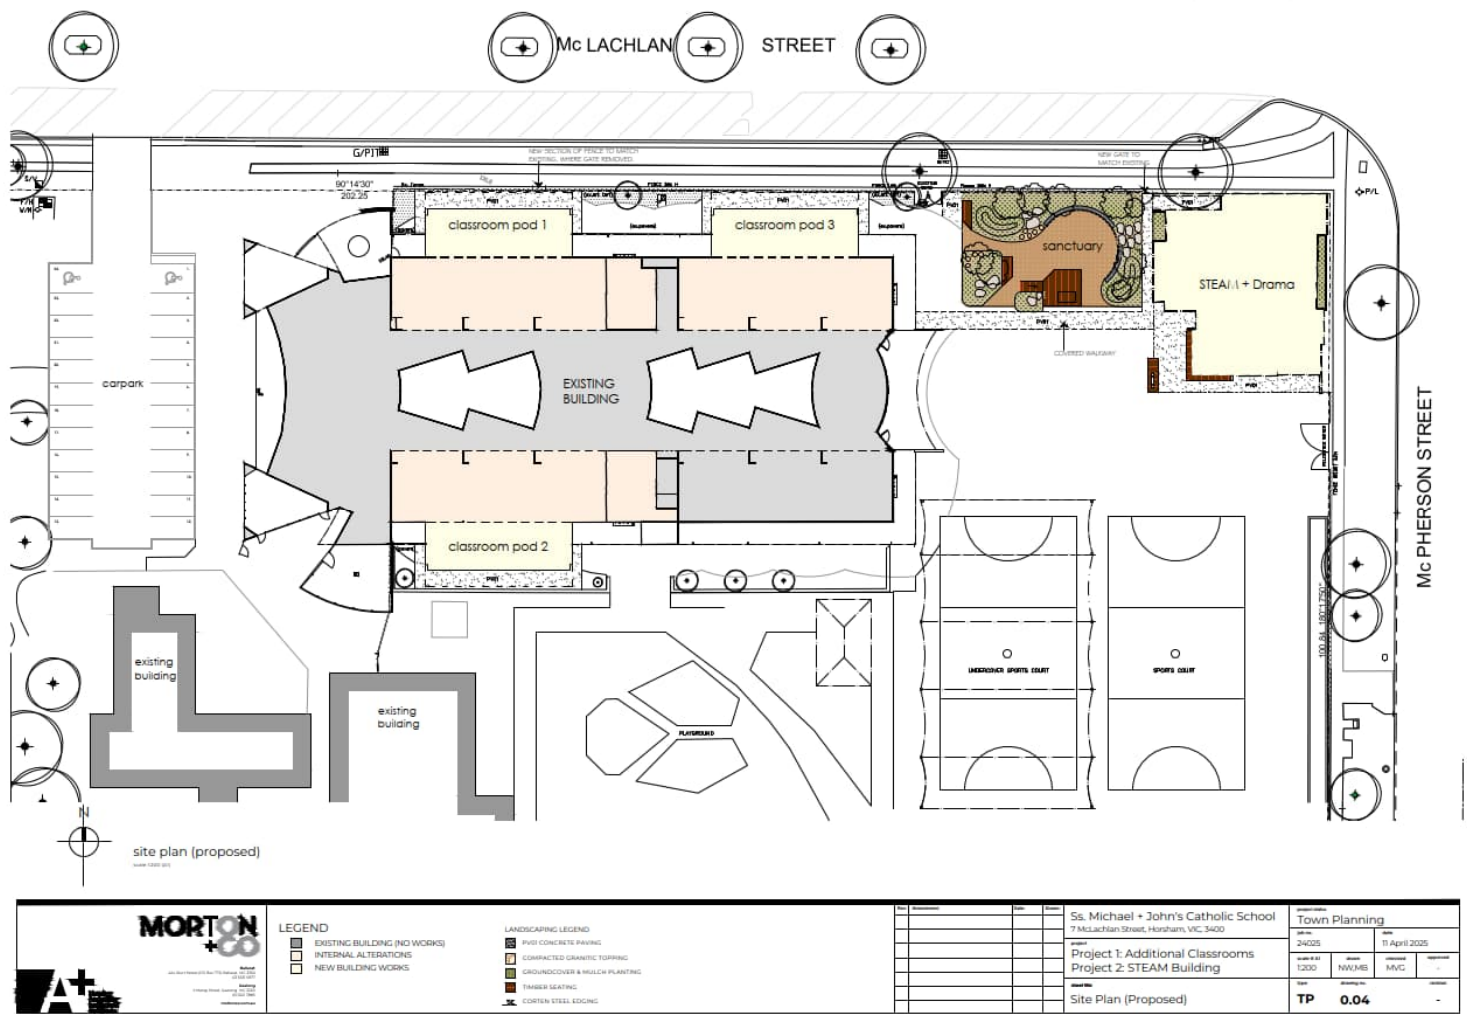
Proposed Site Plan (Source: Morton & Co Architects)
